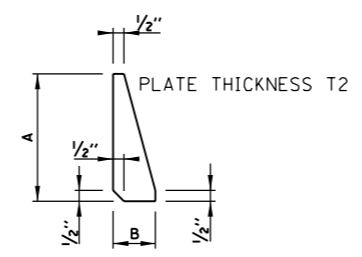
DETAIL FOR MOUNTING SECONDARY SIGN PANEL
